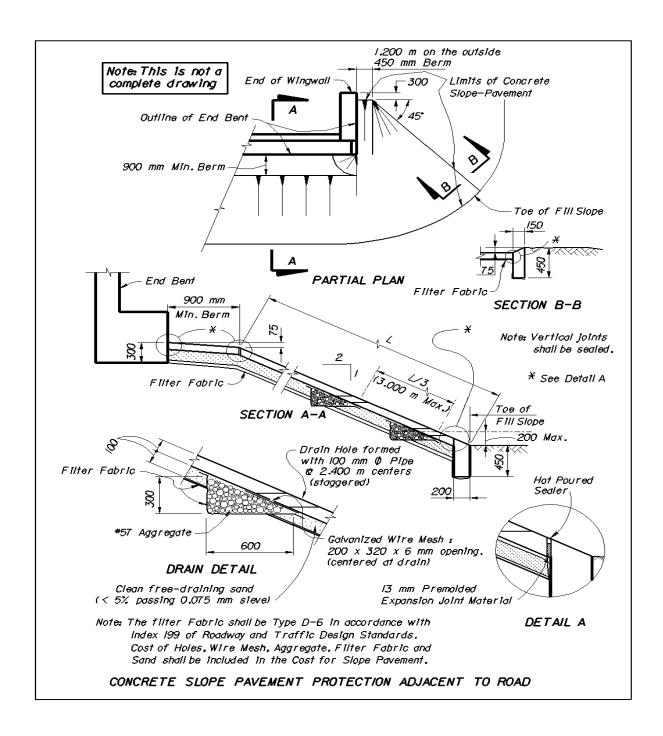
Concrete Slope Pavement Protection Adjacent to Road
